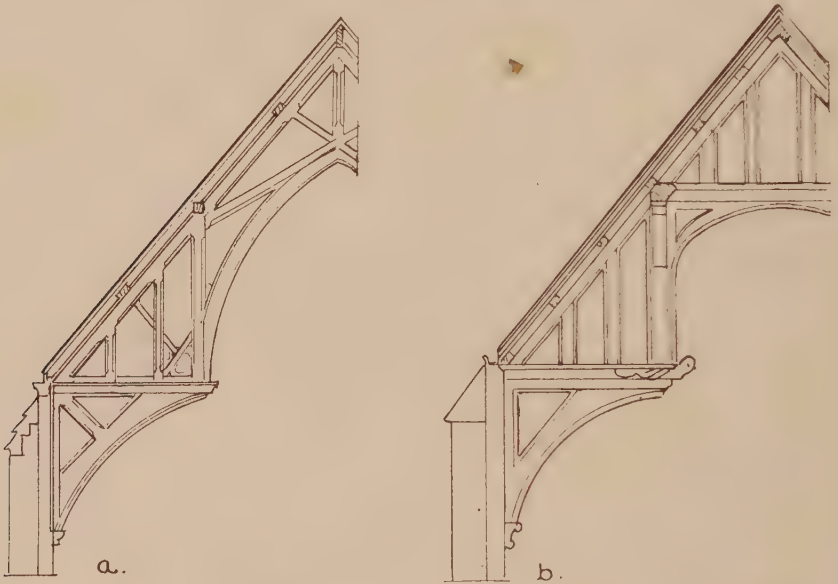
(a) Hammer beam with scissors truss above; (b) hammer beam with A-truss.
